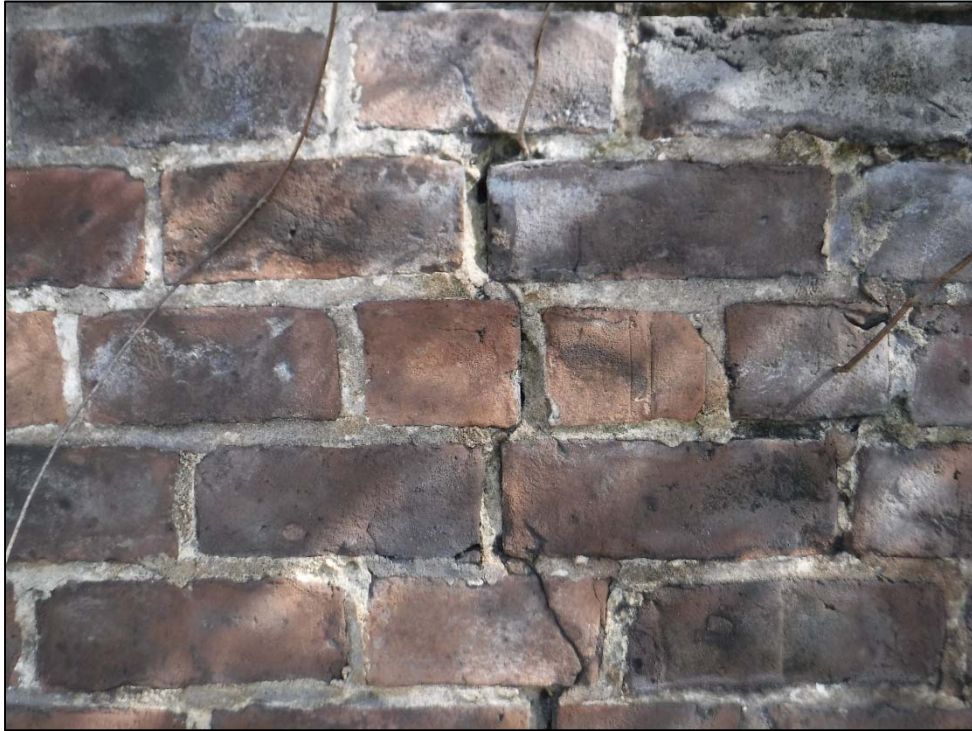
Diagonal Crack with Damaged/Crack Brick in Southwest Wingwall
